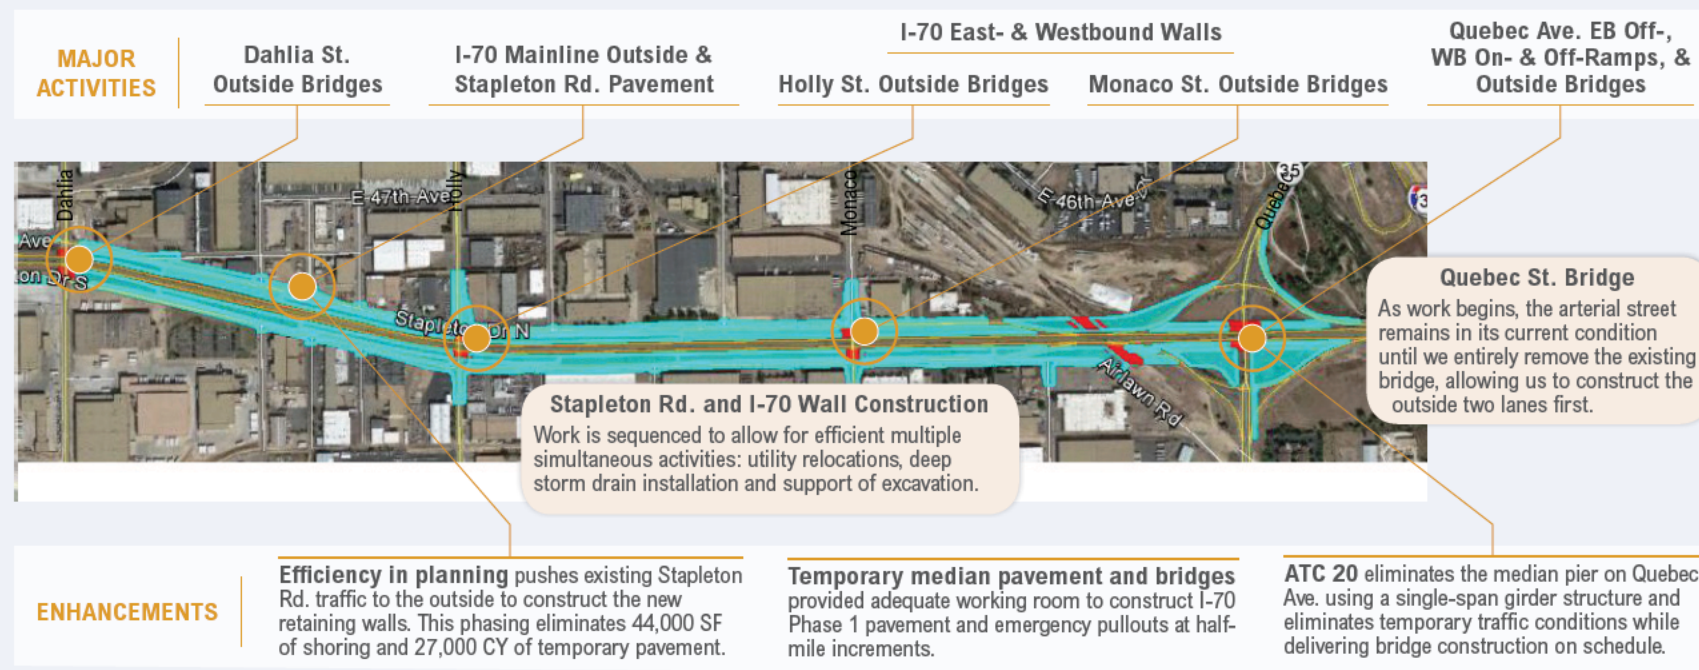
| Schematic of Work Area 2, Dahlia to Sand Creek: We will use an “outside-in” approach to deliver this work area, which includes the elevated section of the project outlined with tall retaining walls and mainline bridges with narrow working room between the elevated I-70 alignment and Stapleton Frontage Road. We have developed a strategy using existing pavement in Work Area 2 that supports early utility relocations and right of way acquisition on Stapleton Road, followed by construction of the mainline retaining wall, bridges and elevated outside lane sections. We will construct lanes wide enough to handle mainline traffic as we build the center section.
